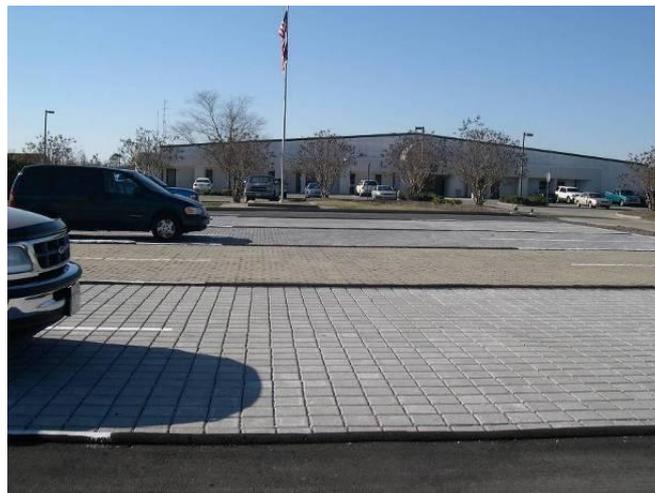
Permeable pavement parking lot at the City of Kinston, NC.
